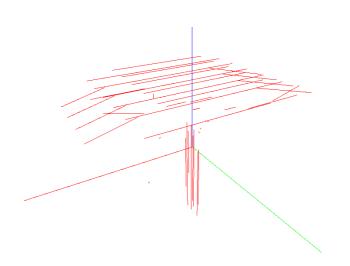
Strut and Tie Layout for Pier with Curved Pier Head
